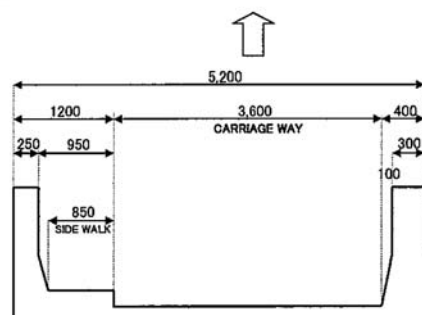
Typical cross section of one-lane bridge (Agreed at the previous meeting for signing technical memorandum on 19th Apr, 2011)
